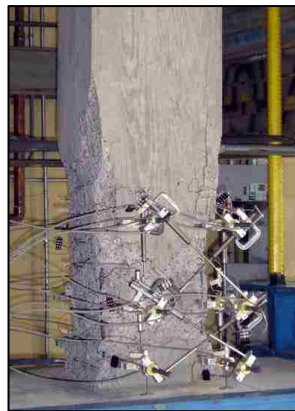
(F5) Concrete Spalling Exposing Longitudinal Steel
